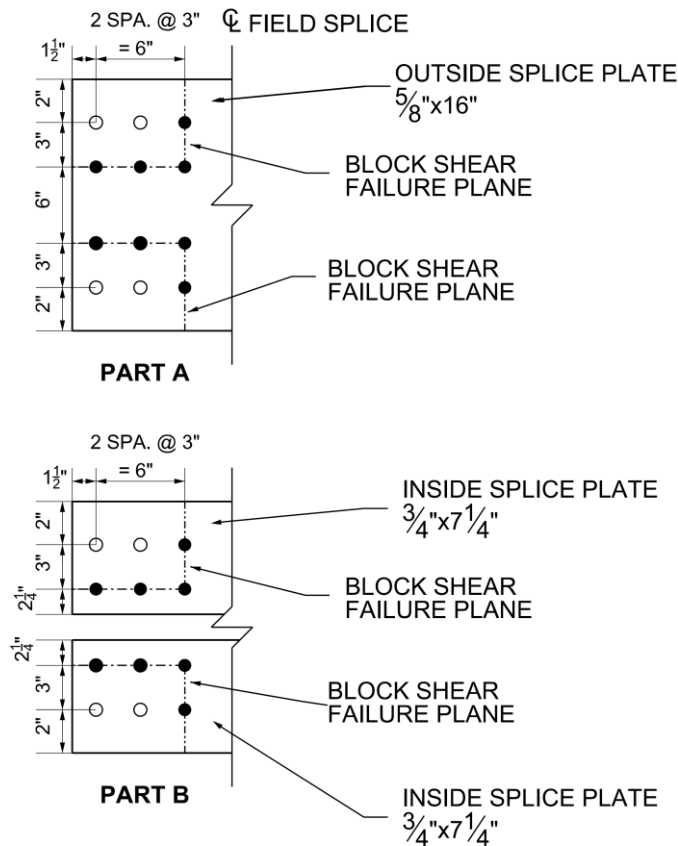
Assumed Block Shear Failure Planes for Top Flange Splice Plates
